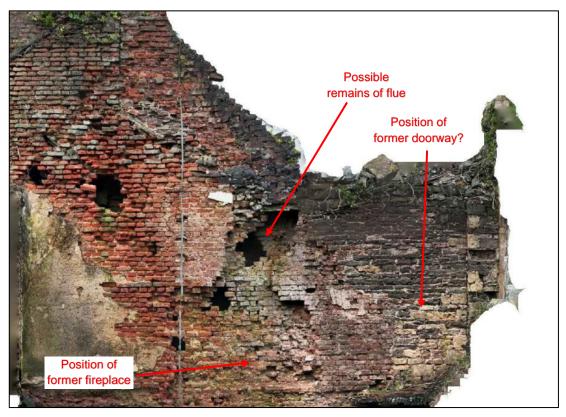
Detail of west wall of Flower Room, third floor of Cell C
